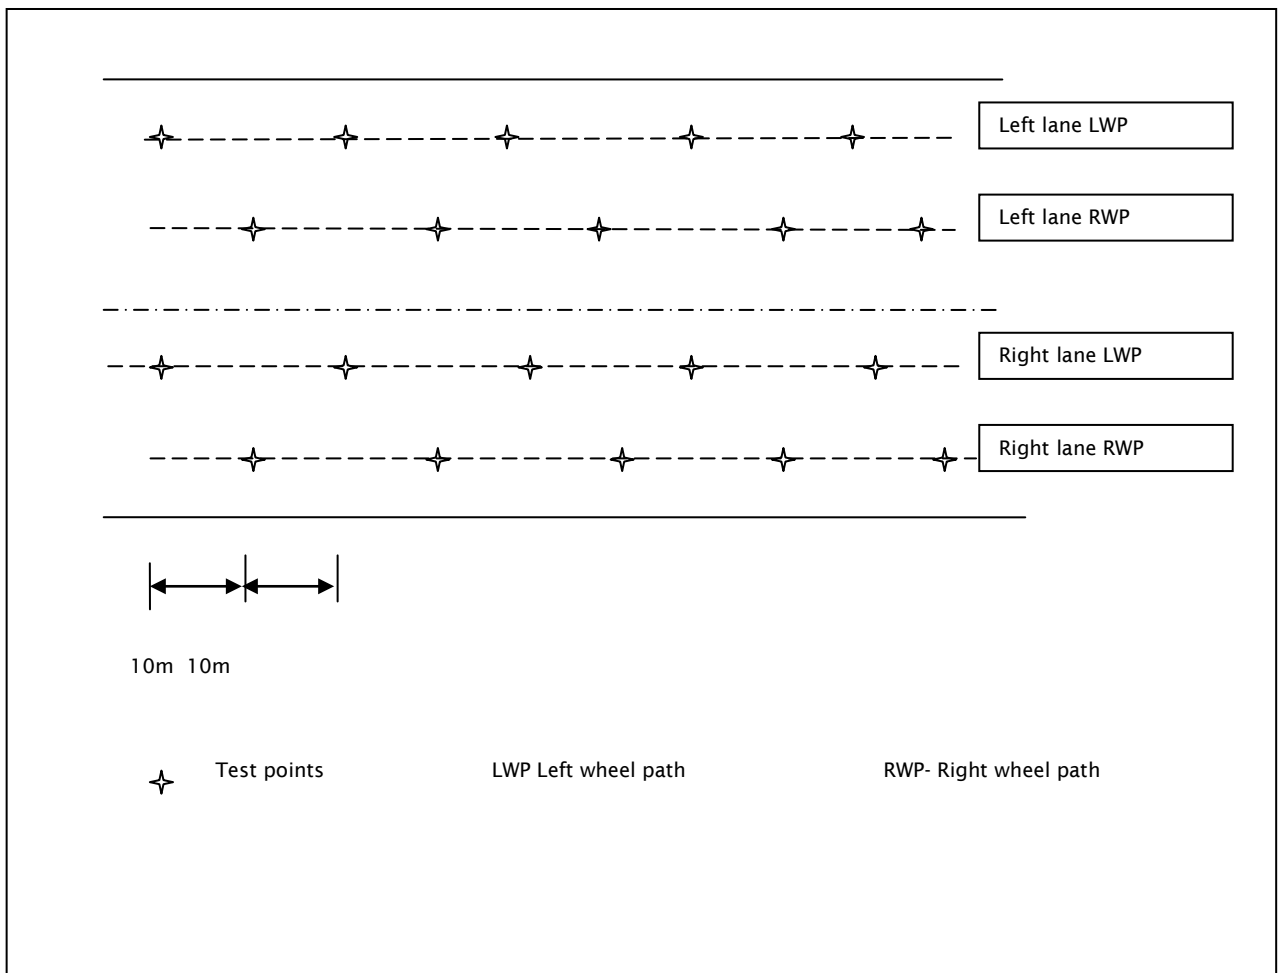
FWD test strip for each location, except the SH1 RP 574 Whitehall
